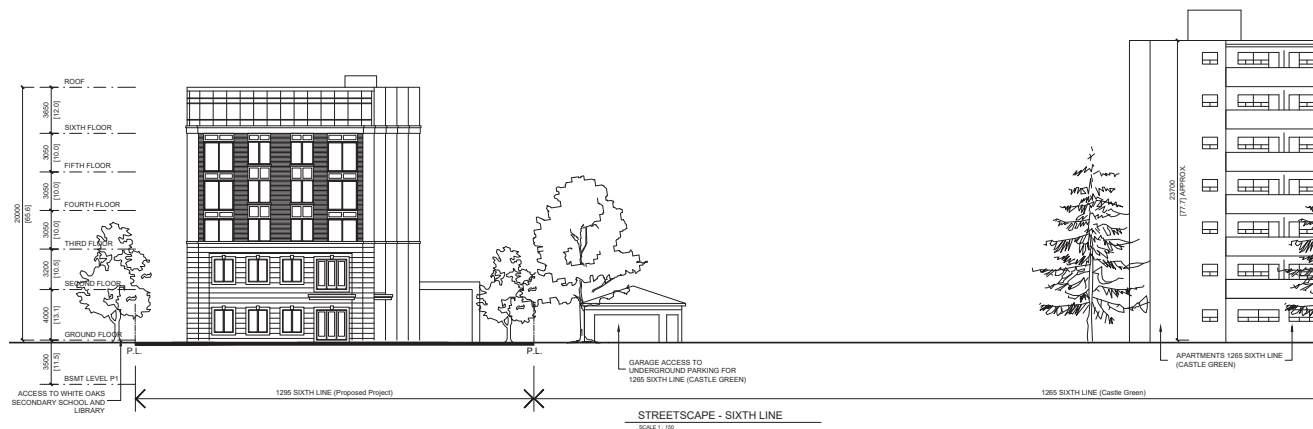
Elevation showing the proposed development within its surroundings streetscape on Sixth Line looking west
